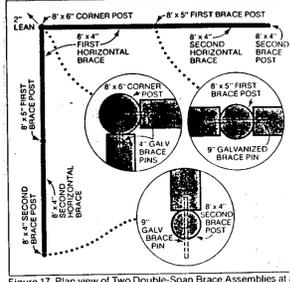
Plan view of Two Double-Span Brace Assemblies at a 90° Corner.
